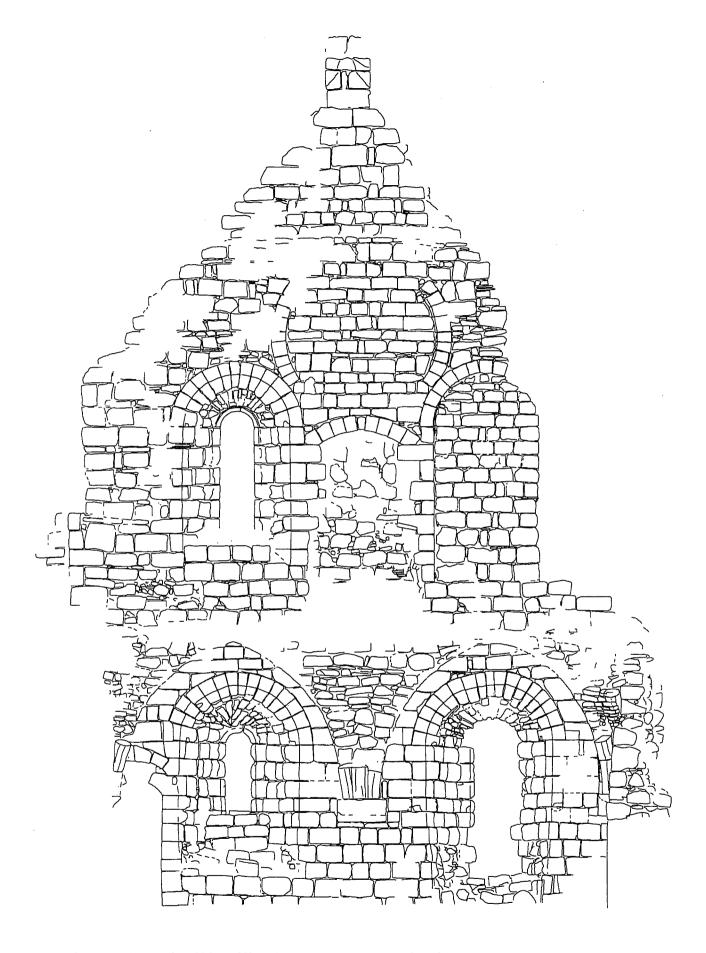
Fountains Abbey, West Guest House, west wall interior. Photogrammetric line drawing. Original scale 1:20
